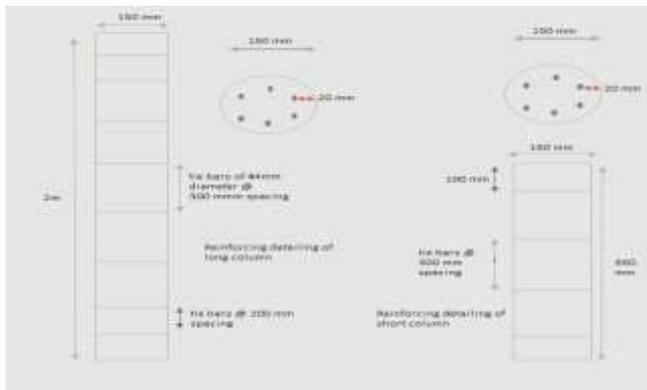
Showing Reinforcing Detailing of Long & Short Columns
